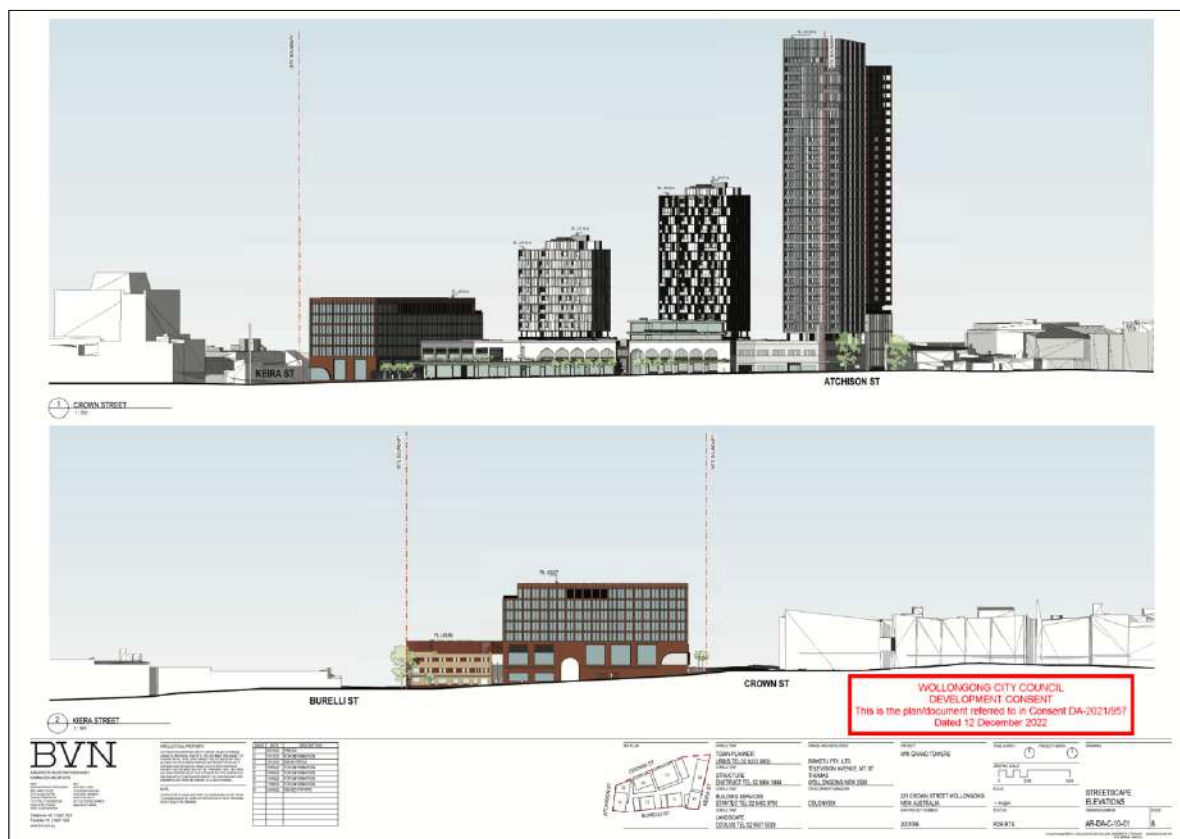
Crown (top) and Kiera (bottom) elevations approved under DA-2021/957.
